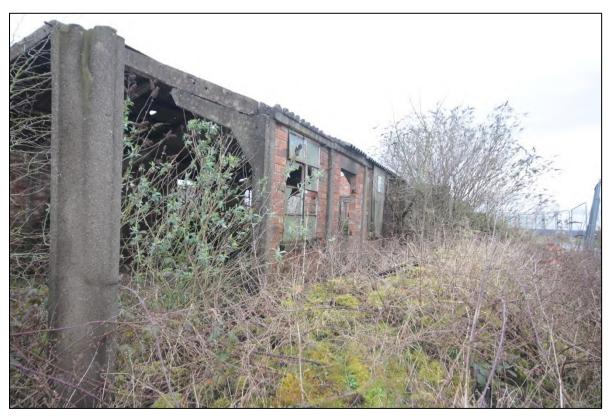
Oblique view of Building 4's eastern elevation, taken facing south-west with 2m scale (File: HBR\_118)
